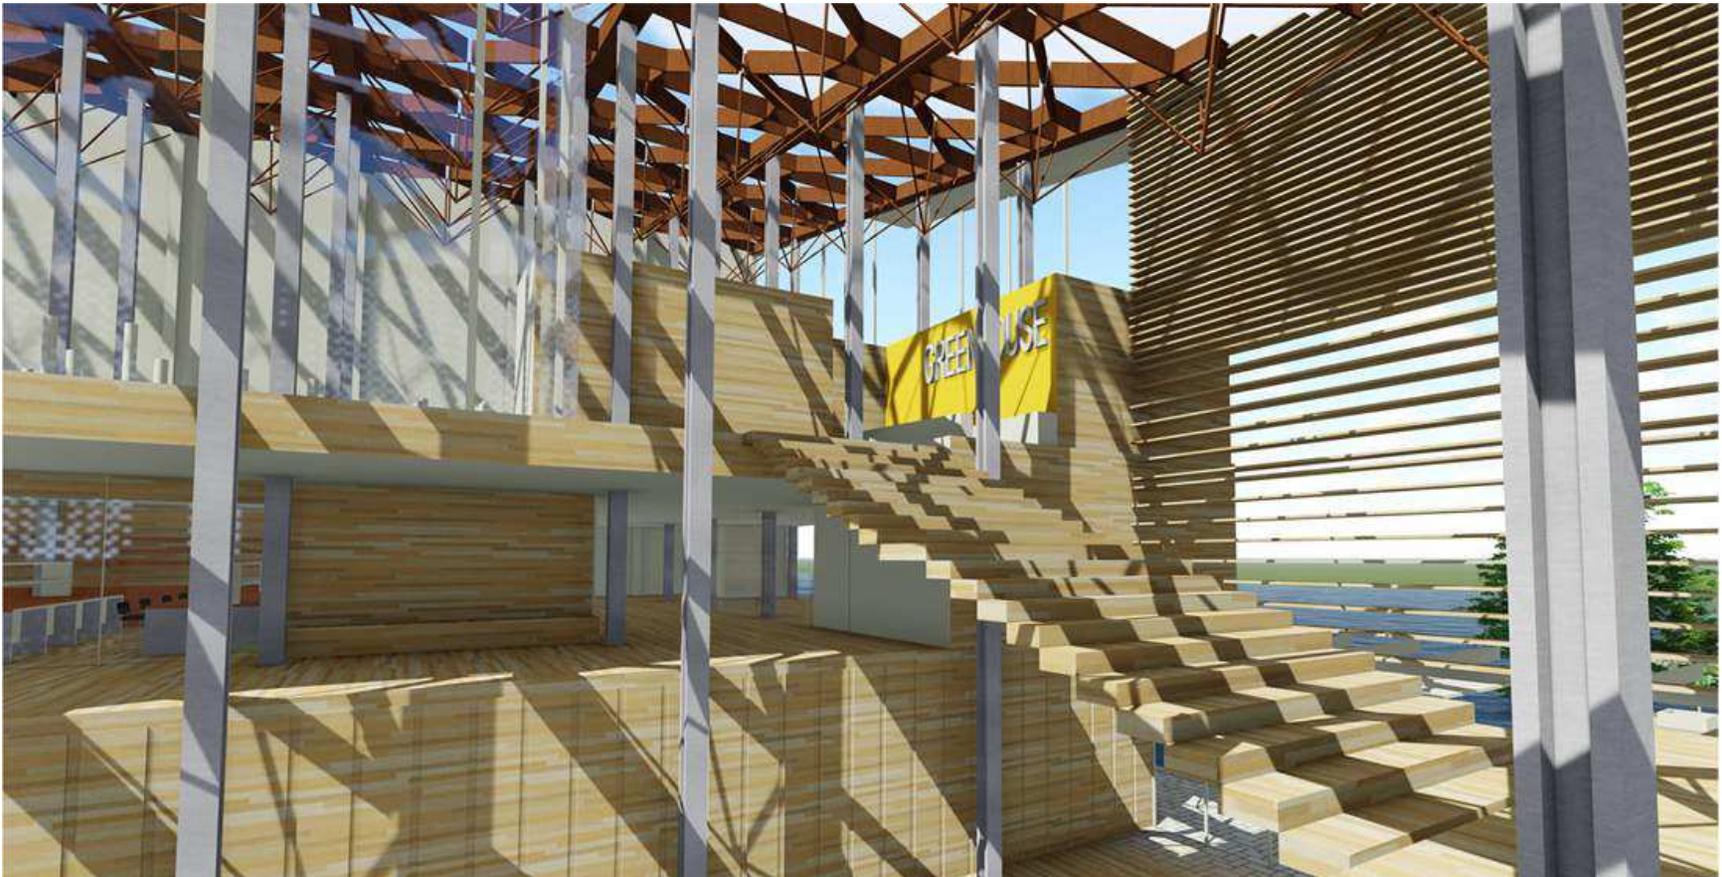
View from Second Floor leading to Commercial Forest Greenhouse
